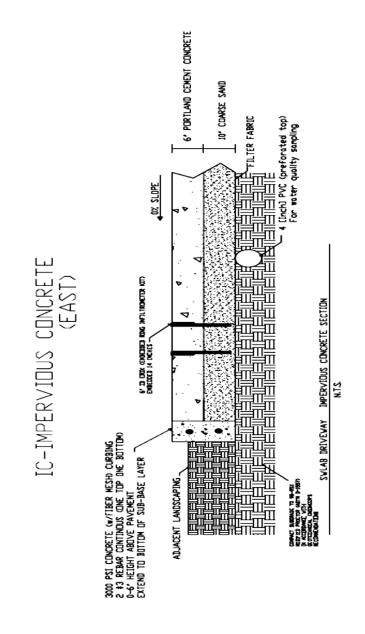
Cross-sectional view of Conventional Impervious Concrete
